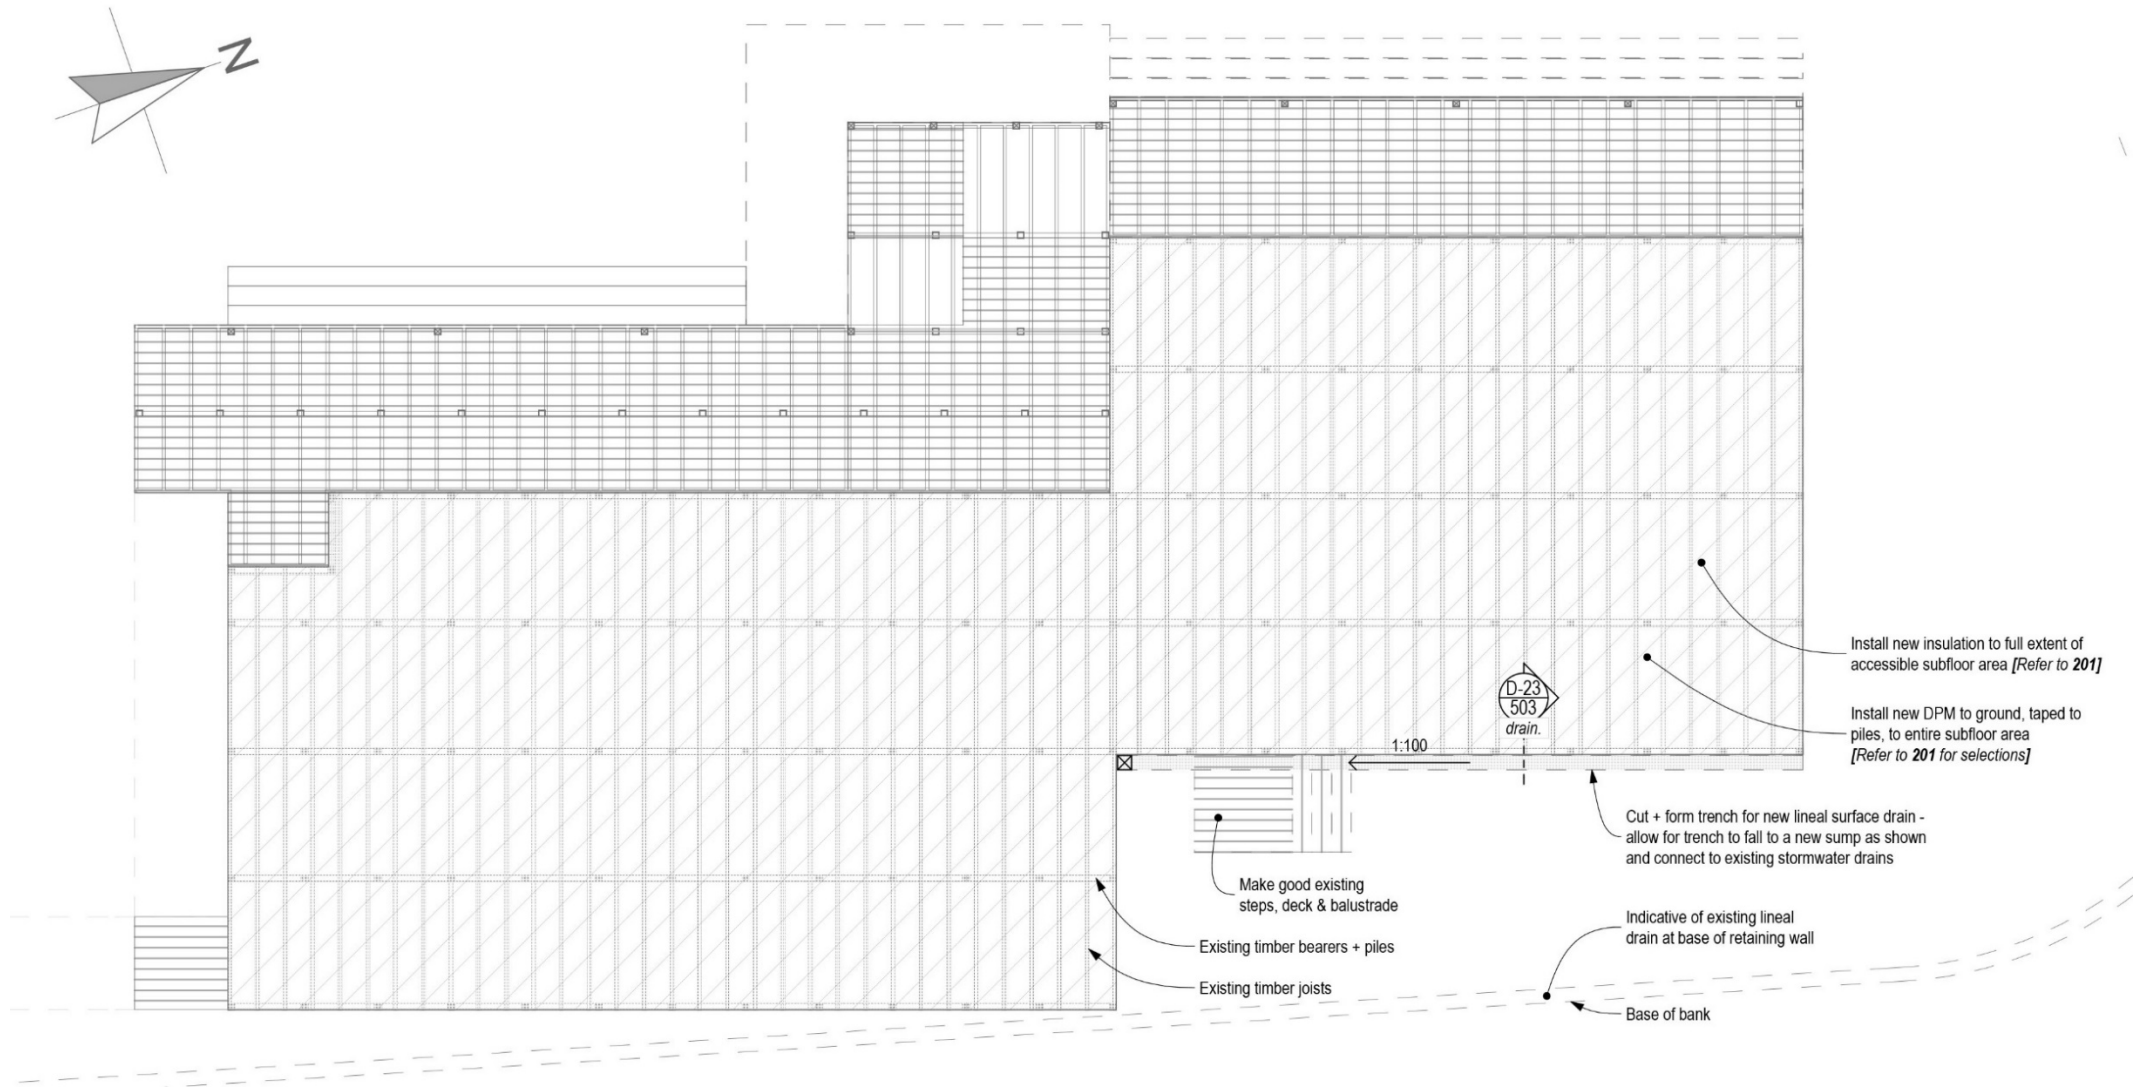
Proposed subfloor plan – refer 100 series Architectural drawings
